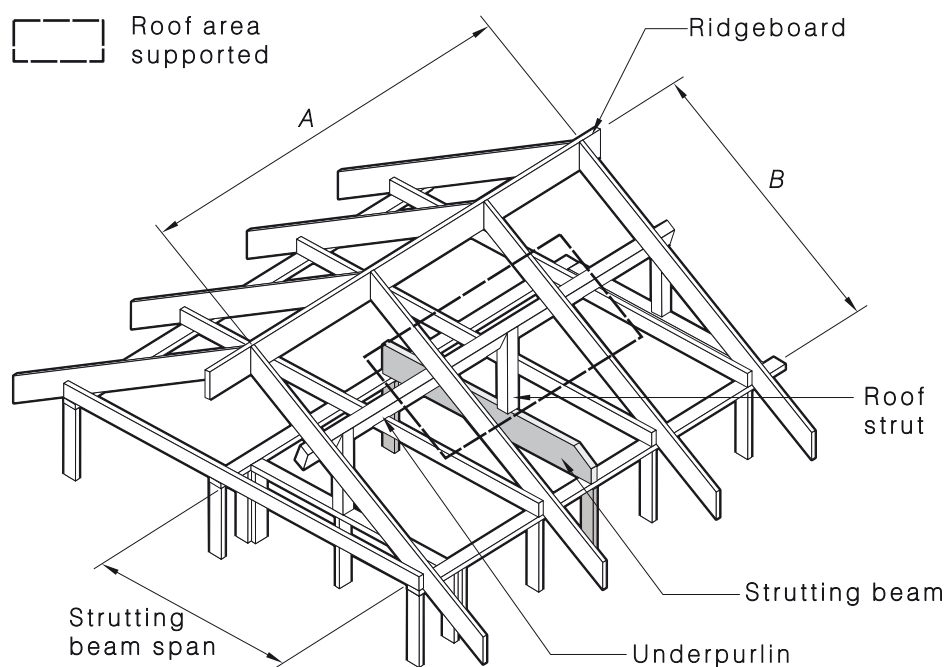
COMBINED COUNTER/STRUTTING BEAMS
